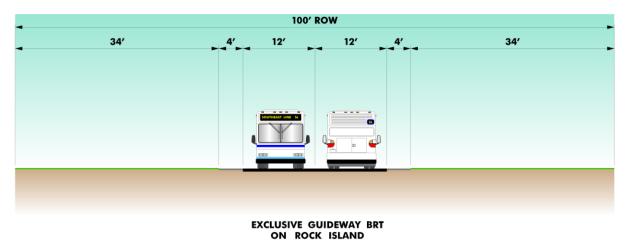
Bus Rapid Transit Rock Island Railroad Typical Section
